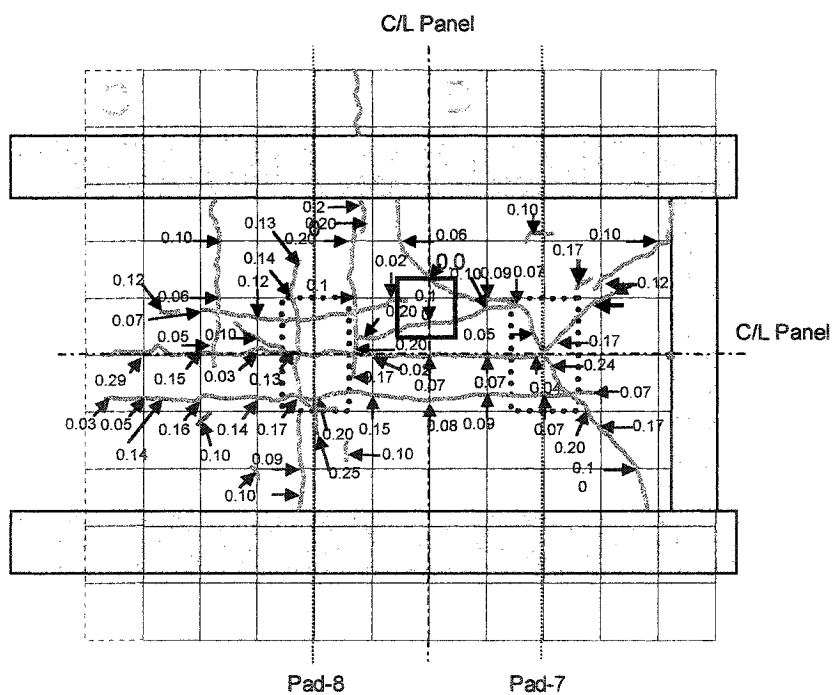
Panel-D: Crack Patterns on Soffit after 1,700 Load Cycles
